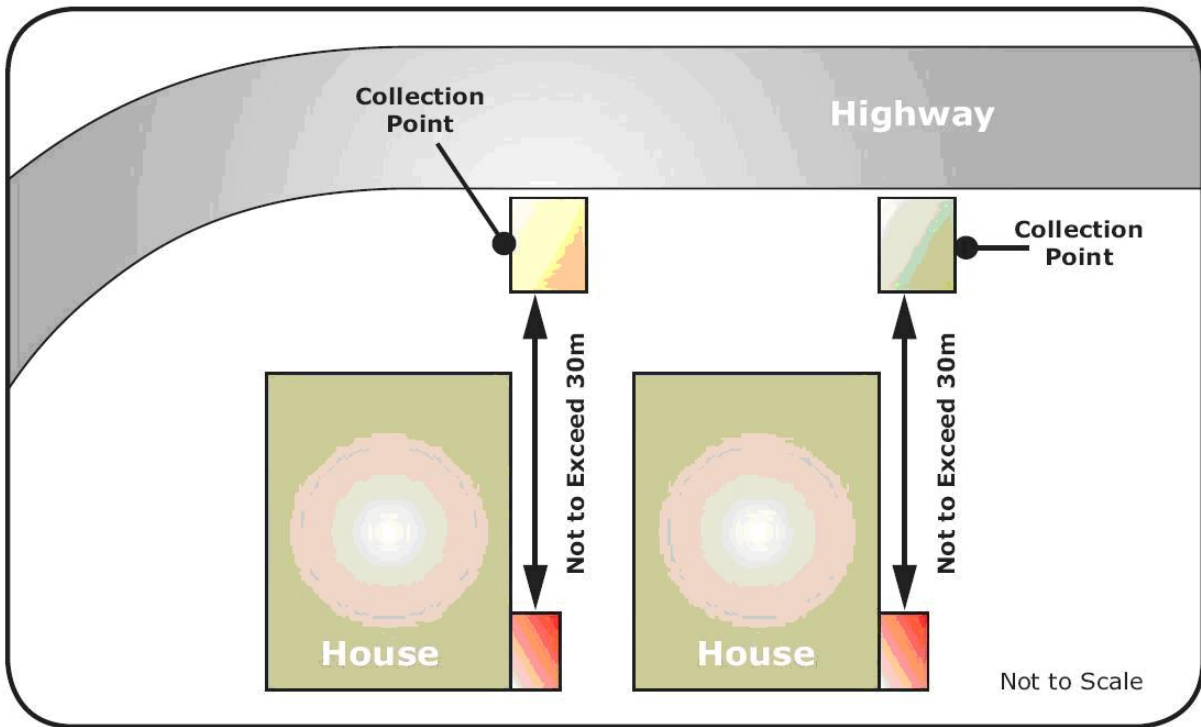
Movement Distances for Waste Containers - Single Houses
